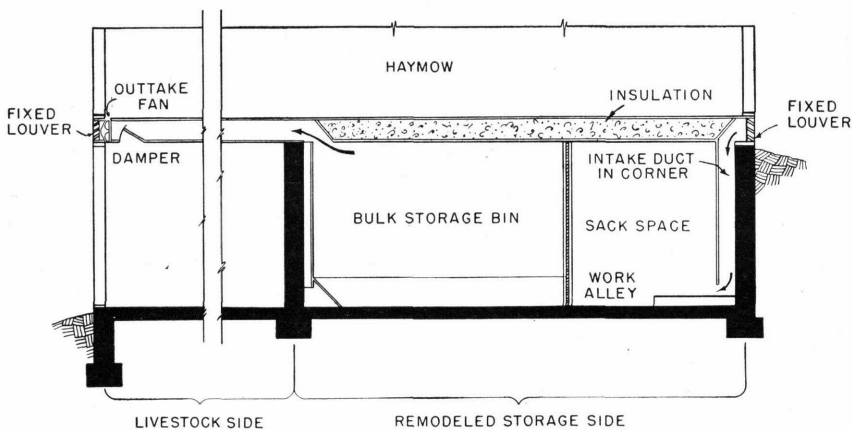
Section of a Lake City, Mich., barn with a built-in potato storage room.
